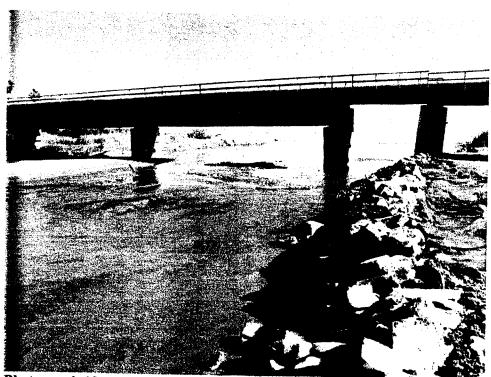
Excavator berm and dredge fill material inside work area (1 April 2005)
